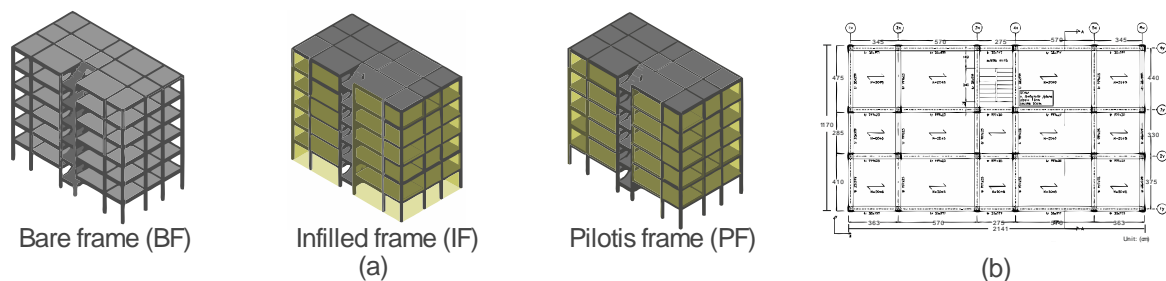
Prototype RC buildings; (a) BF, IF; PF buildings; (b) plan view.
